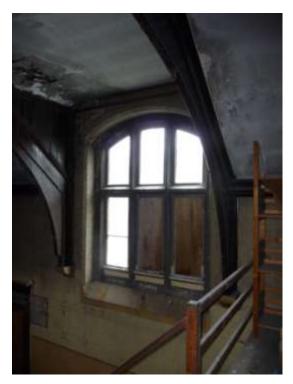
Two of the most significant architectural features are the roof timbers springing from corbels and the mullioned and transomed windows
